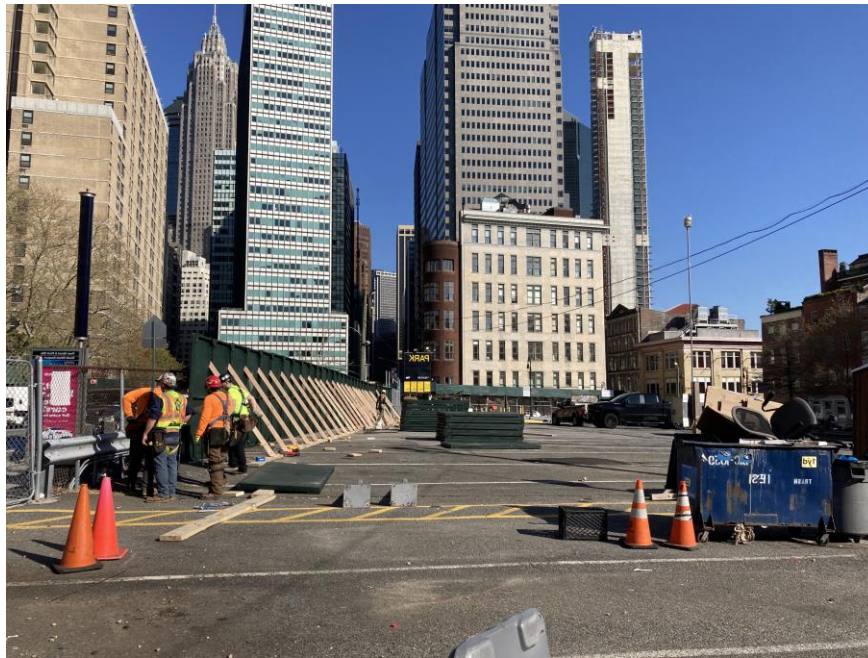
View of perimeter construction fencing installed along the northern boundary of the site (facing west).
